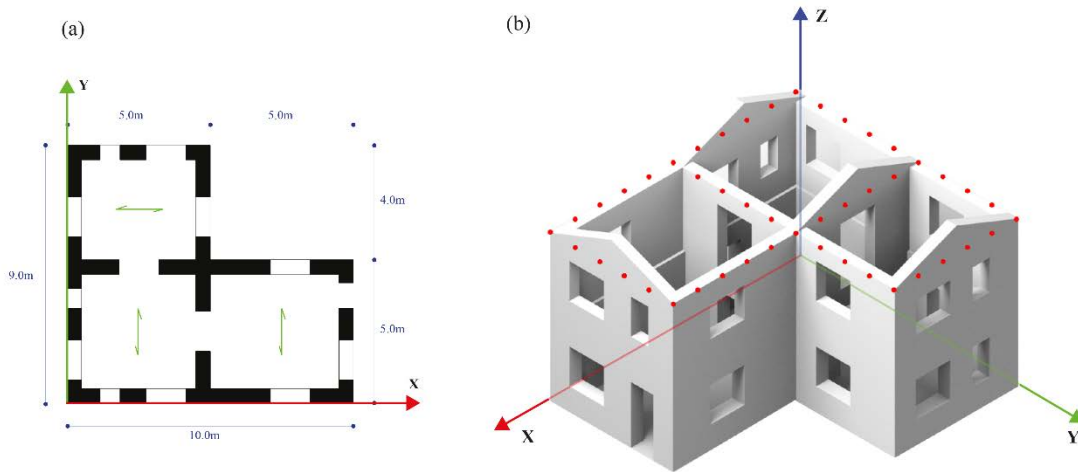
Geometry of the case study. (a) Plan view of the ground floor; (b) 3D view.
